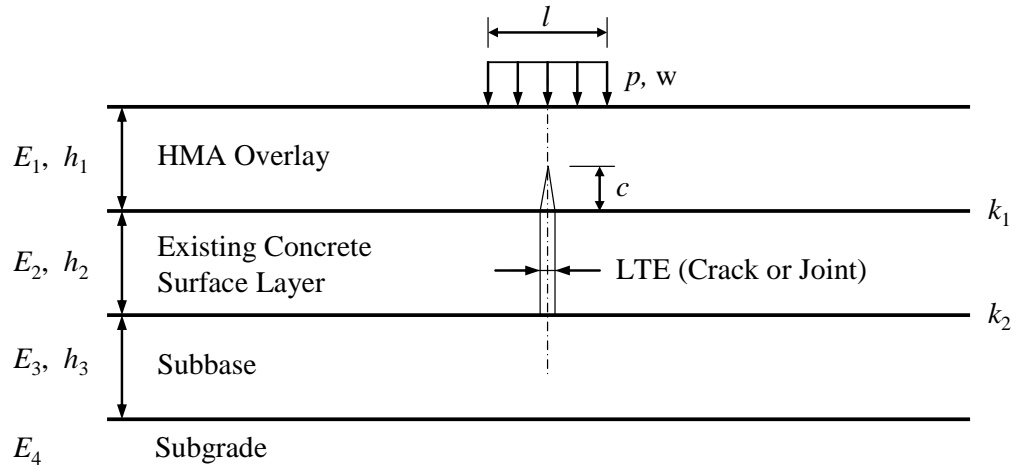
Diagram of HMA overlay on jointed concrete pavement-bending.
